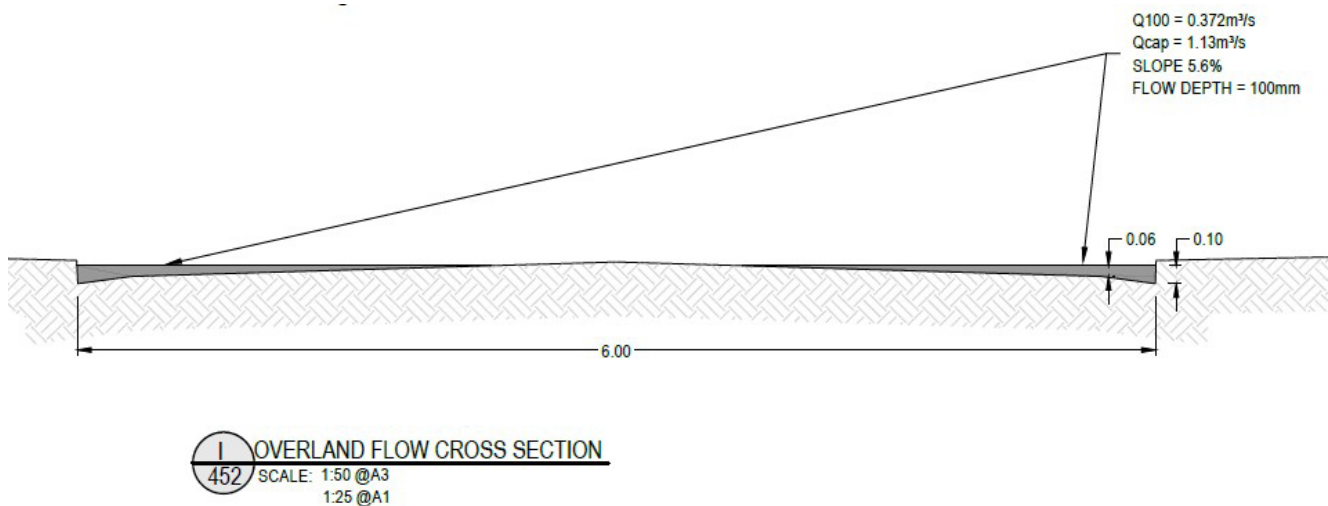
Orah Road Subdivision Plans – Stormwater Overland Flow Paths – Typical Cross-section
